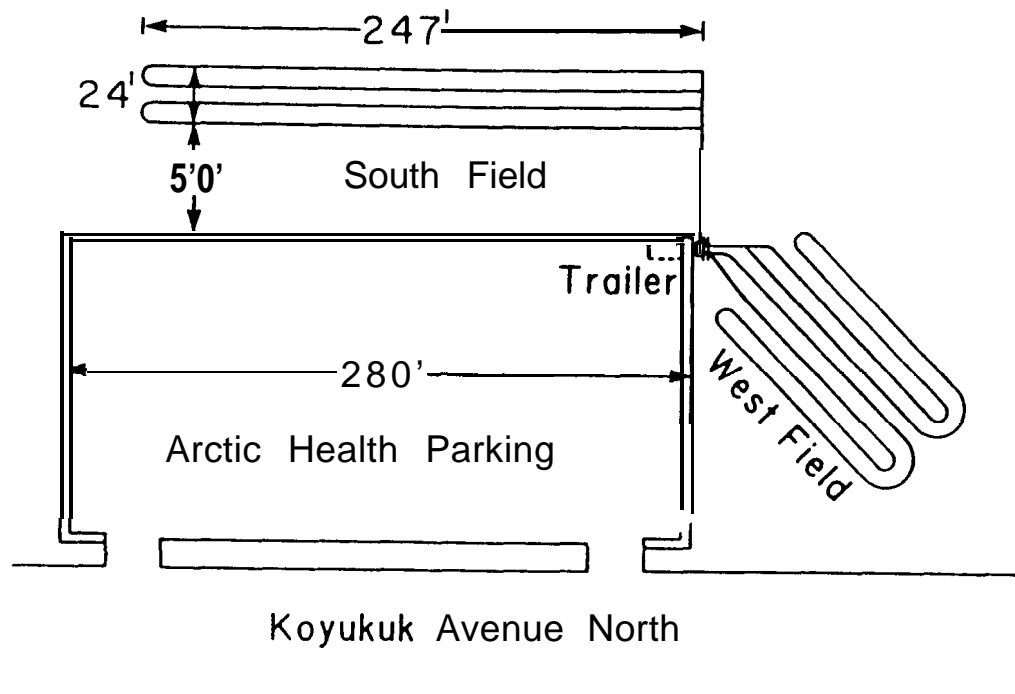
Location of the test installation and layout of the four 500-foot pipe sections.
